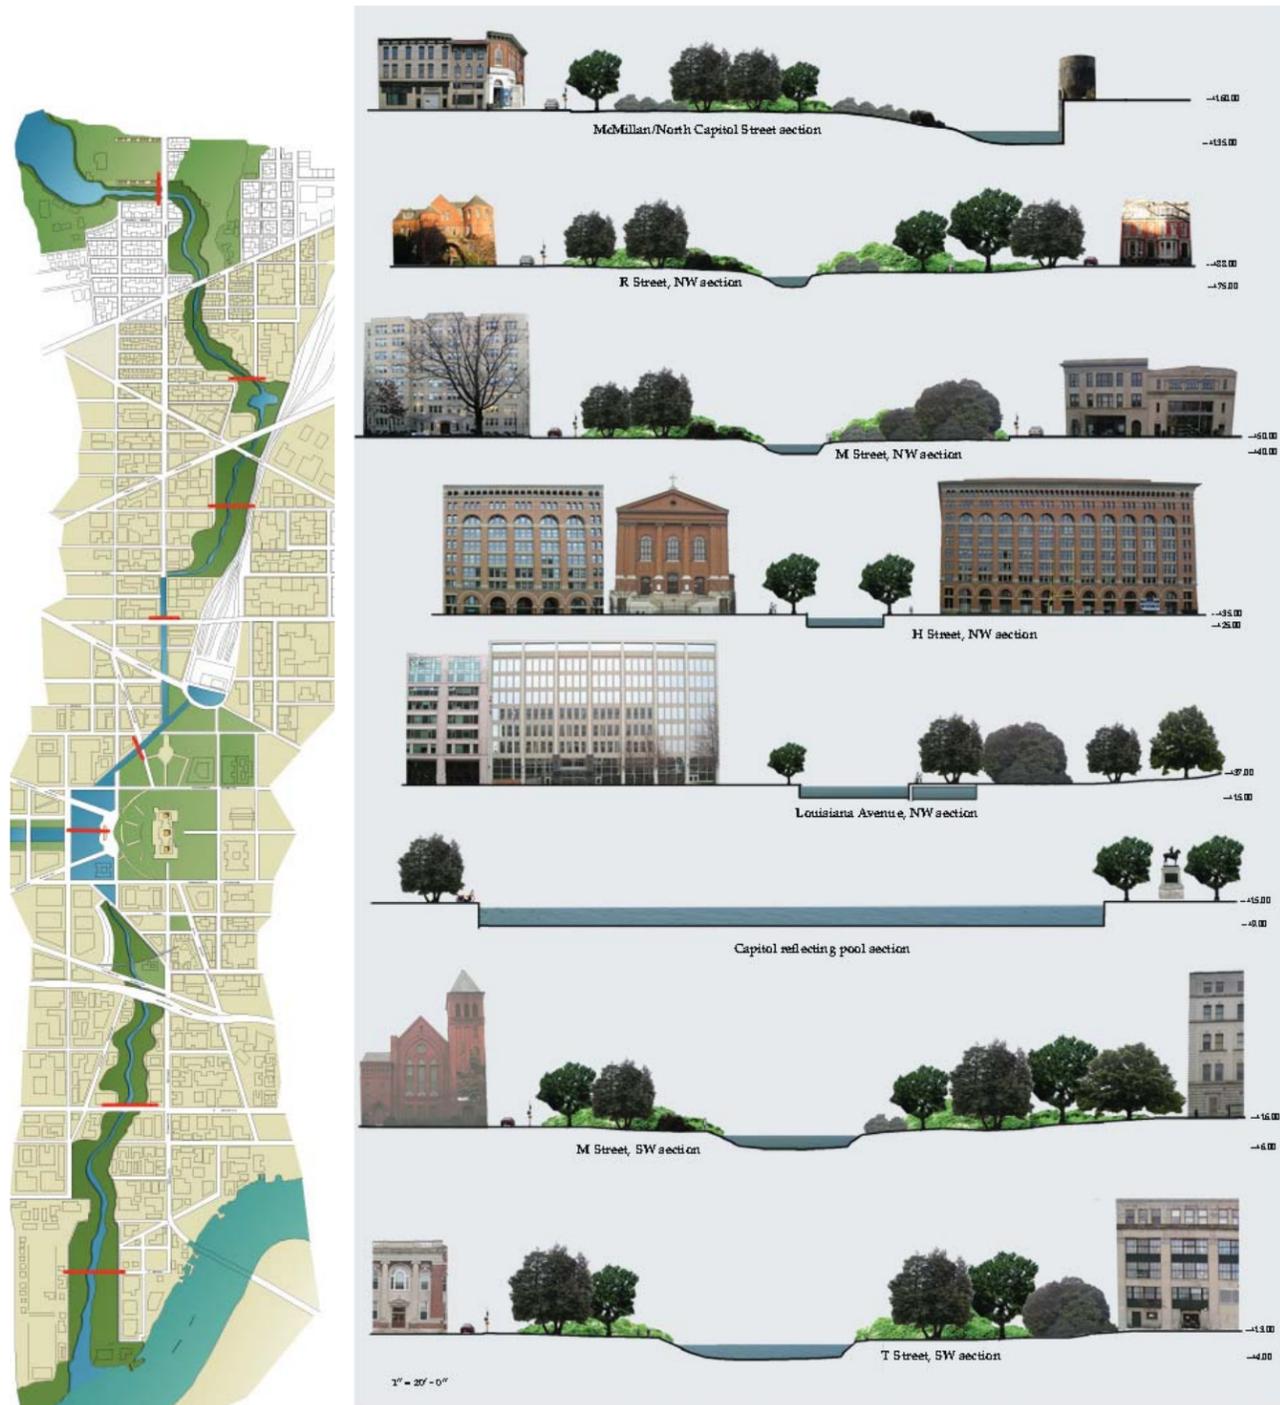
Eight sections along the proposed channel route. Key to sections at left in red.
